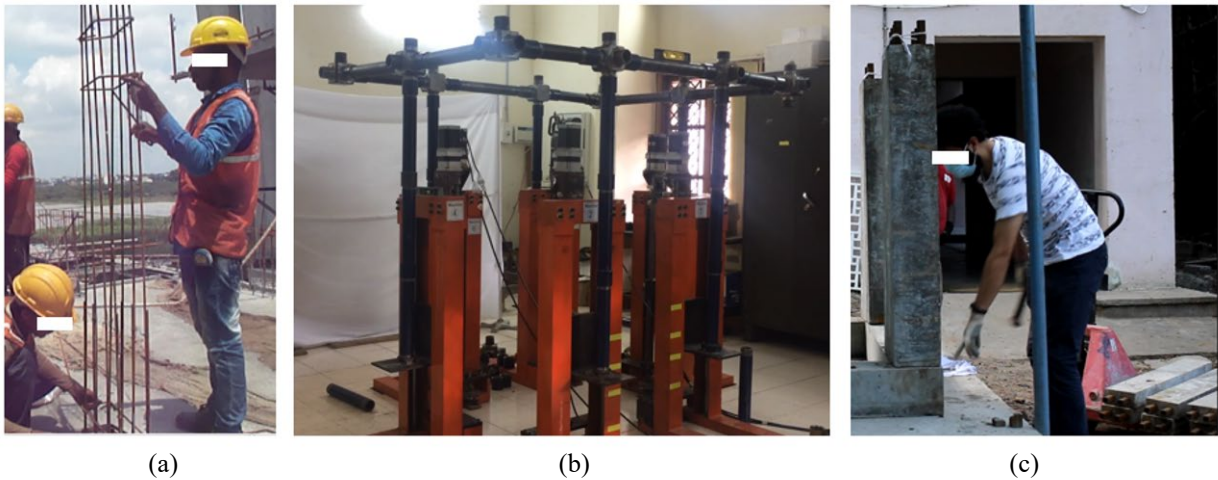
Construction process typology cases: (a) RCC frame assembly, (b) steel frame assembly, and (c) precast frame assembly
